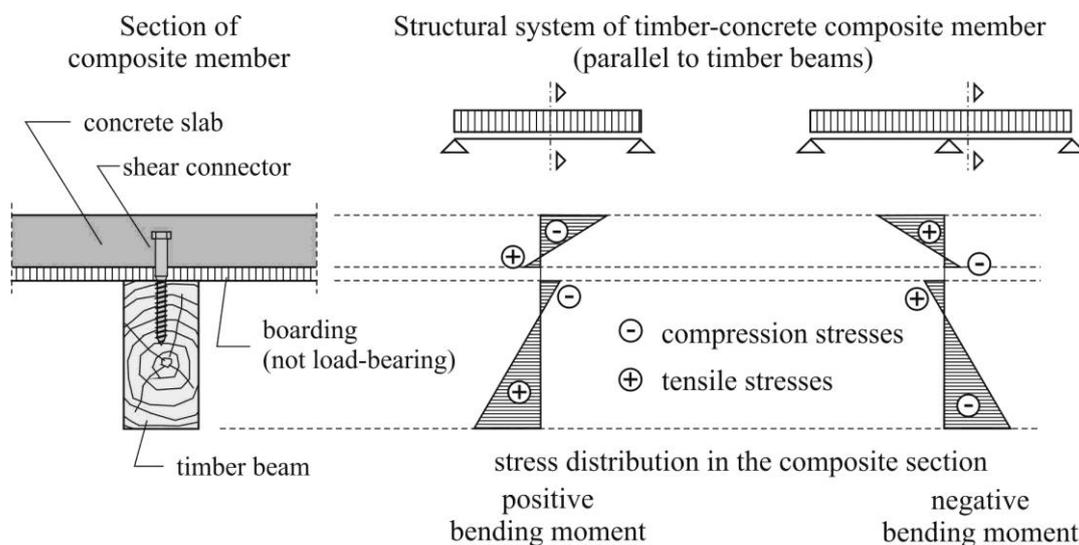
Timber-concrete composite members in case of strengthening of existing timber beam ceilings
